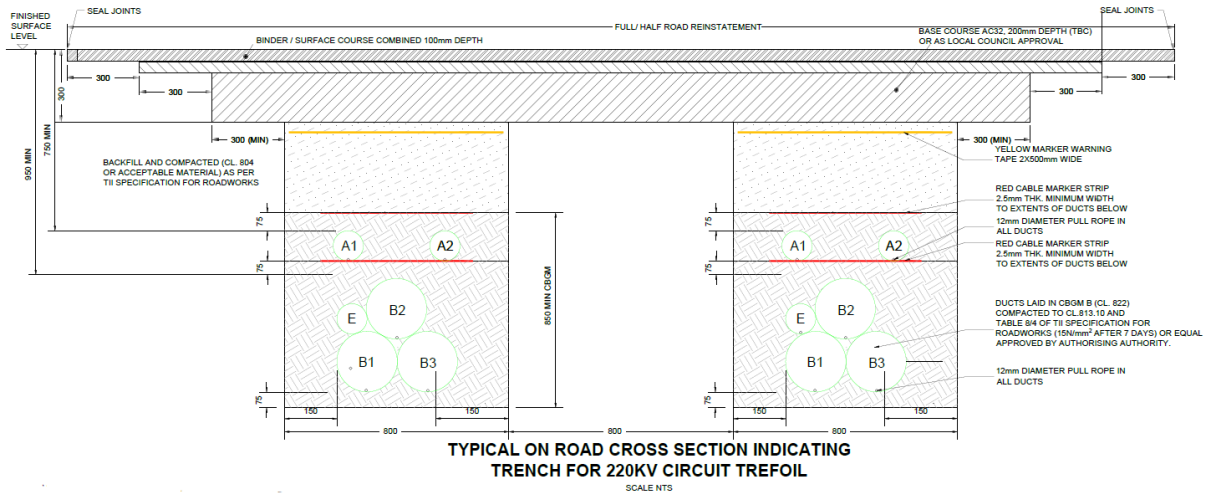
Indicative Trench Cross Section – Trefoil Arrangement
